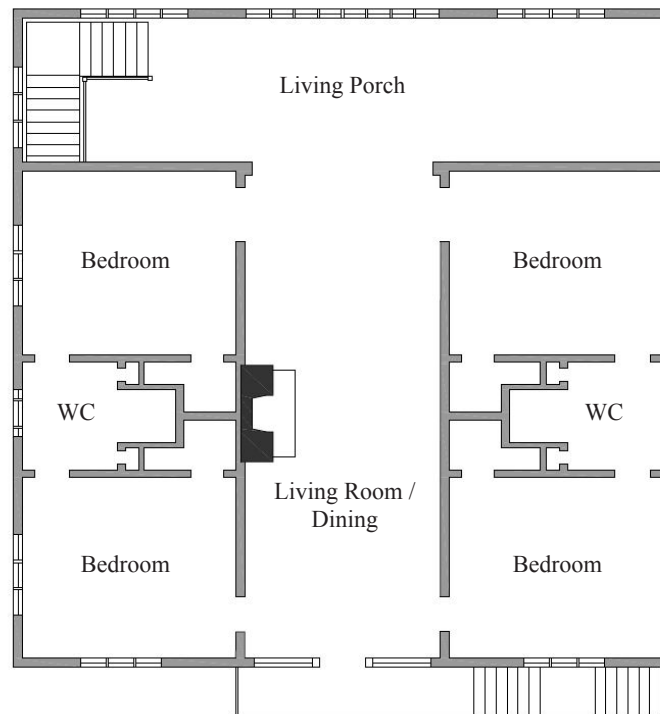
Second design of the Panama House, Second Floor Plan. Plan followed by Quarters S and T. Drawing by author based off plans from RDA.
